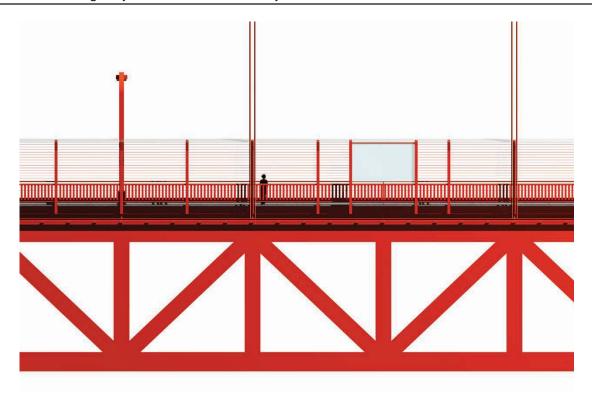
ALTERNATIVE 1A: ELEVATION AT ACCESS GATES
